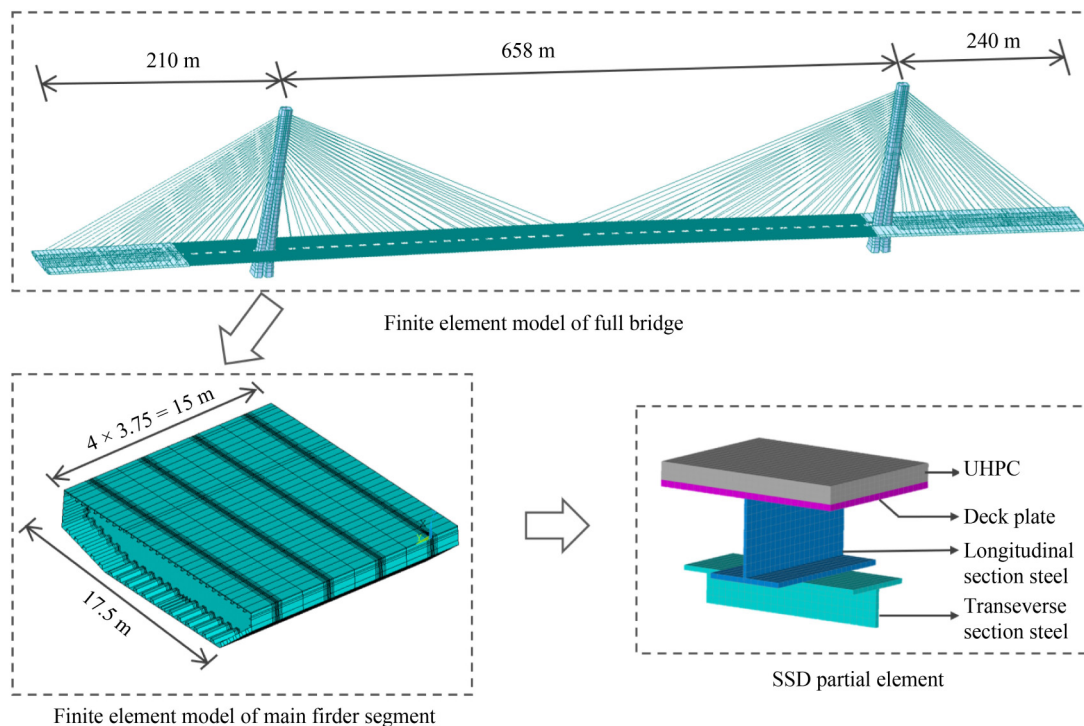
FE calculation model of full-bridge and main girder segment.
